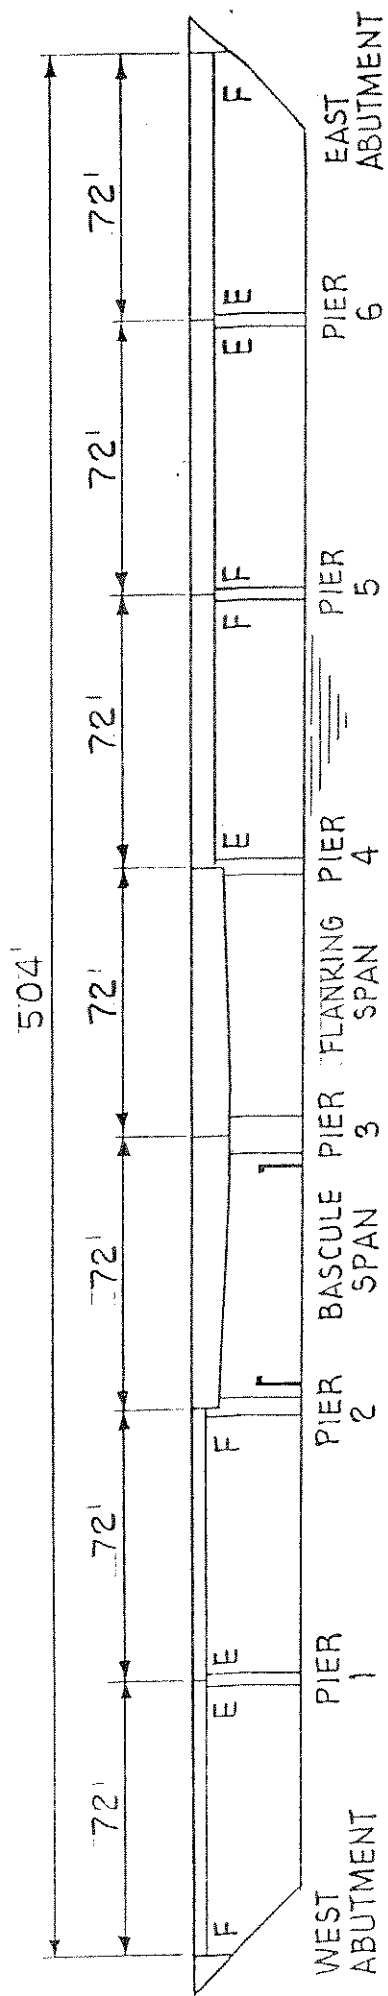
ELEVATION OF BRIDGE NO. 2
